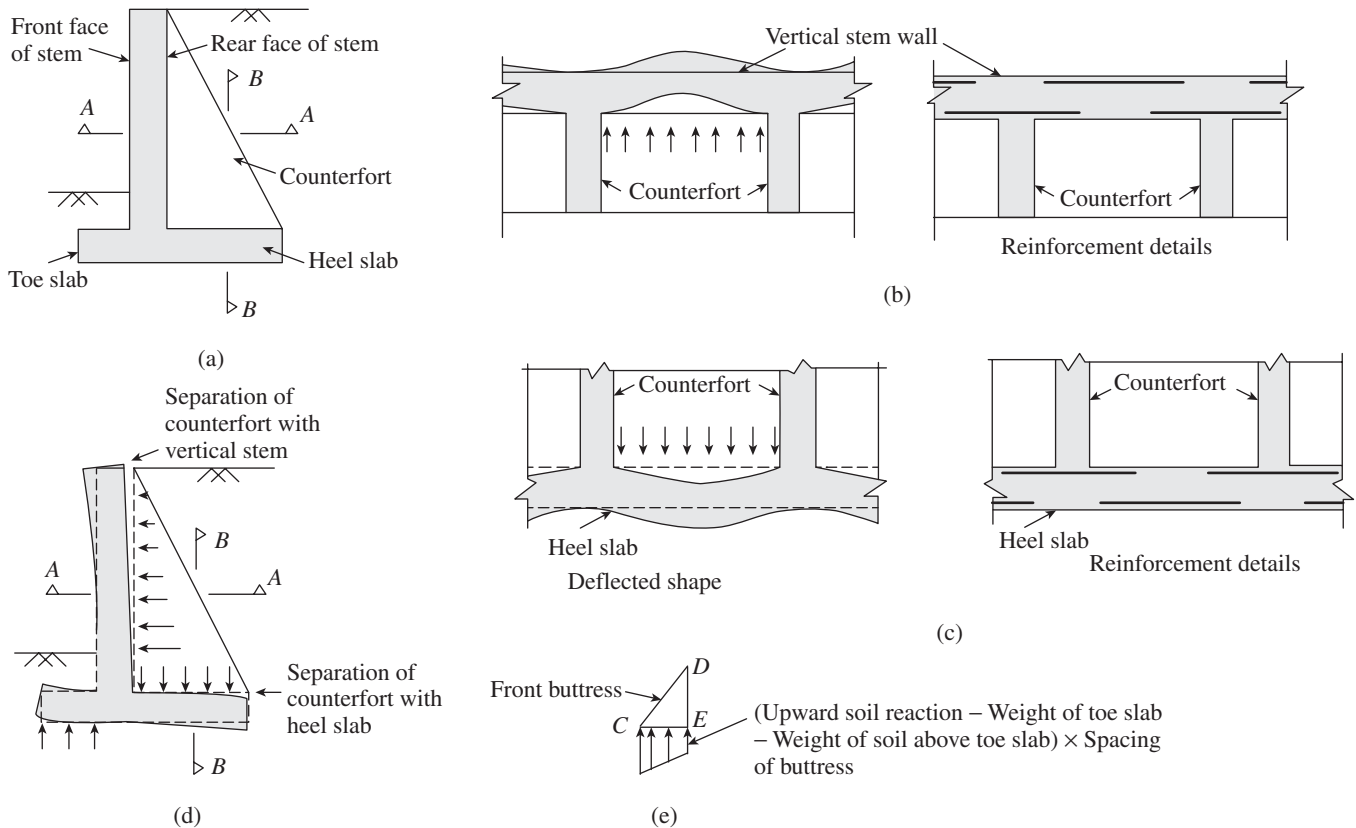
Behaviour of counterfort-retaining walls (a) Counterfort-retaining wall (b) Horizontal section of vertical stem wall (Section A–A) (c) Vertical section through heel slab (Section B–B) (d) Counterfort interface with stem and heel slabs (e) Forces on toe buttress (if provided)
